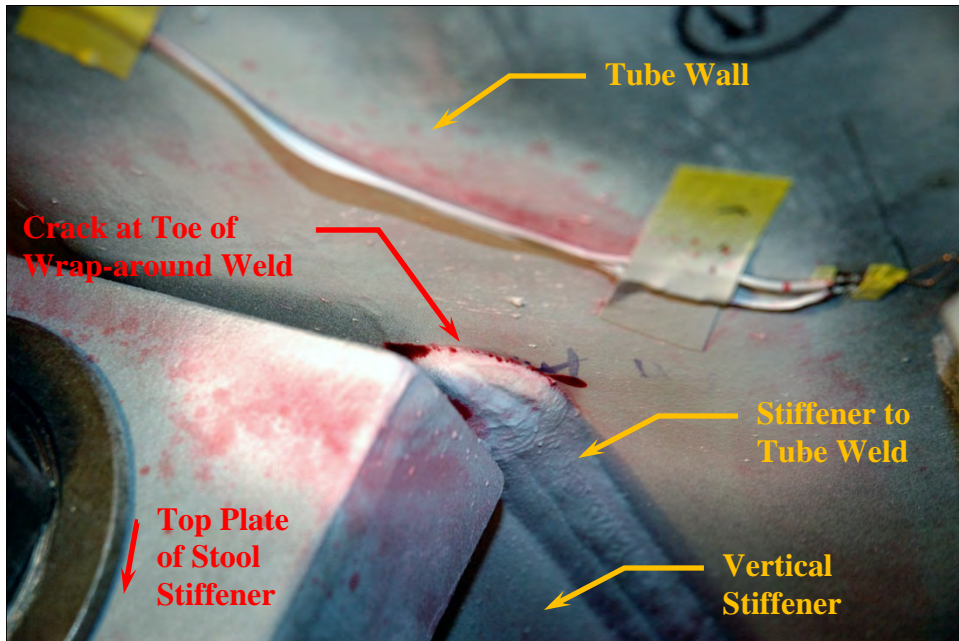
Fatigue crack initiation in specimen IX-2
